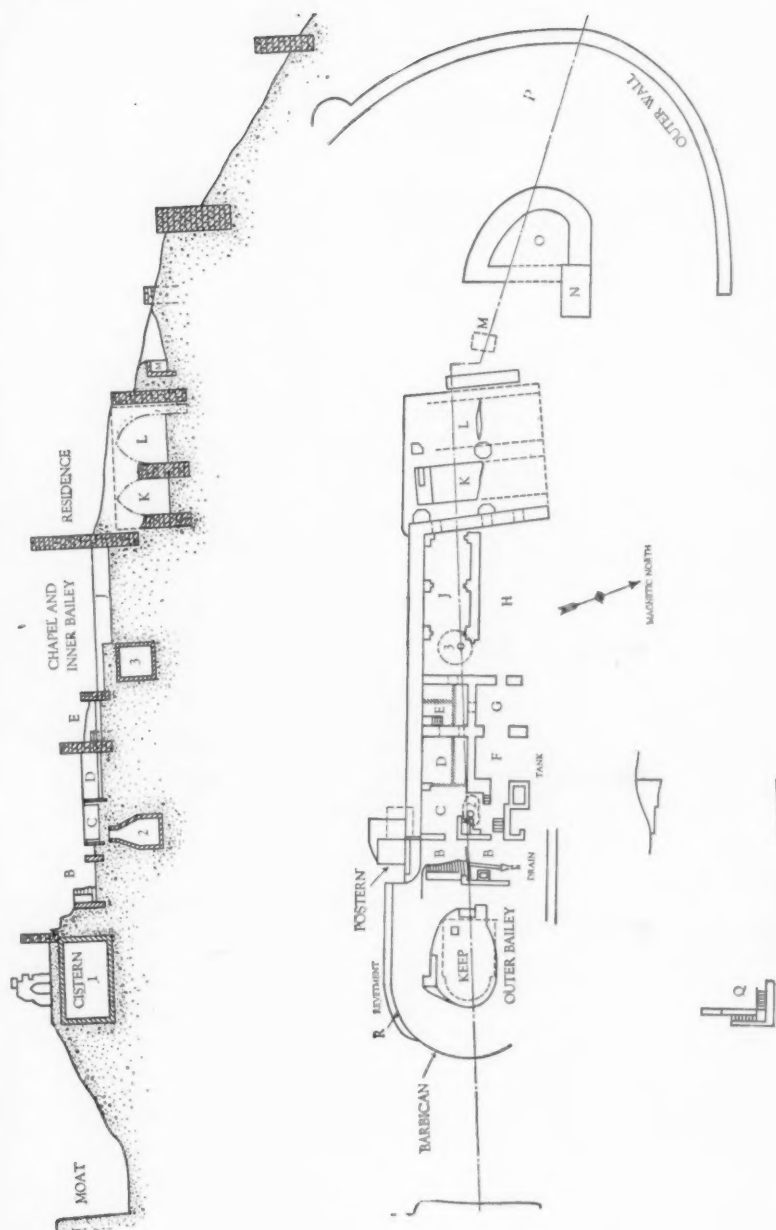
SECTION AND PLAN OF THE CASTLE. 1 INCH EQUALS 85 FEET
